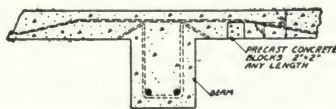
Inexpensive Method of Supporting Wire Mesh Reinforcement Over Concrete Beams
